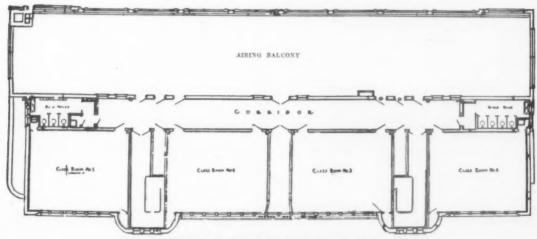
B. SECOND FLOOR PLAN, NEWARK OPEN-AIR SCHOOL
